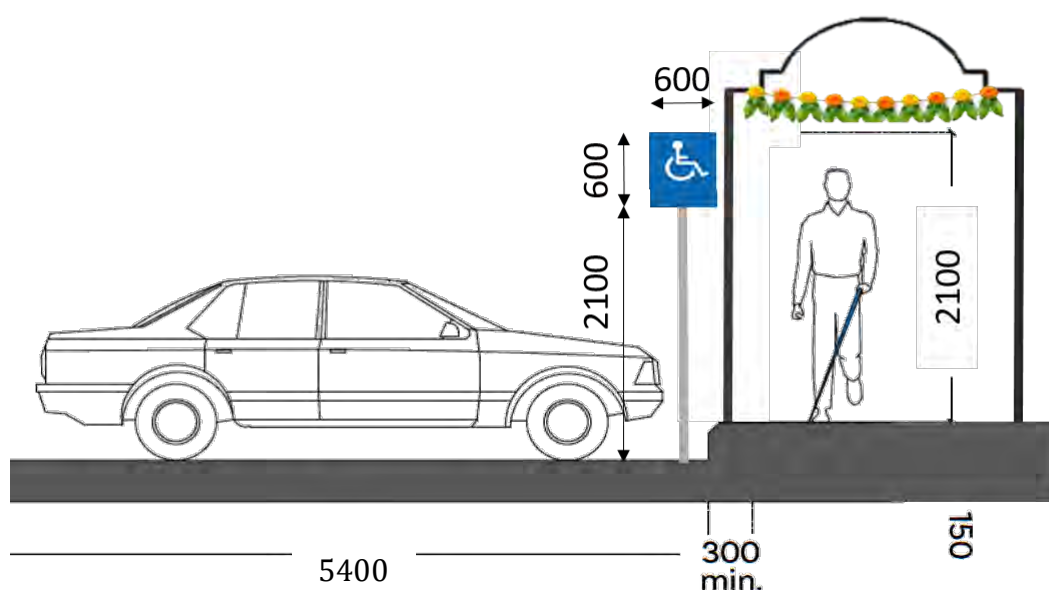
Barrier free parking leading to accessible route to the pandal
